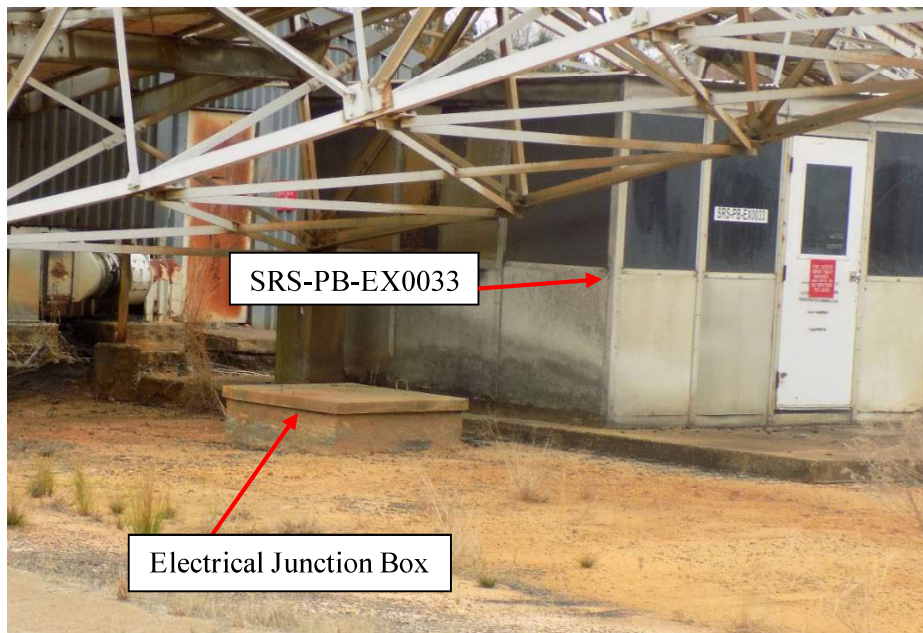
SRS-PB-EX0033 Coal Handling Breakroom Building for Crusher House
